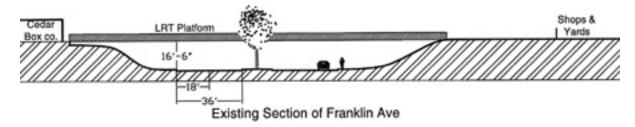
Existing section through Franklin just east of the LRT bridge and platform.
